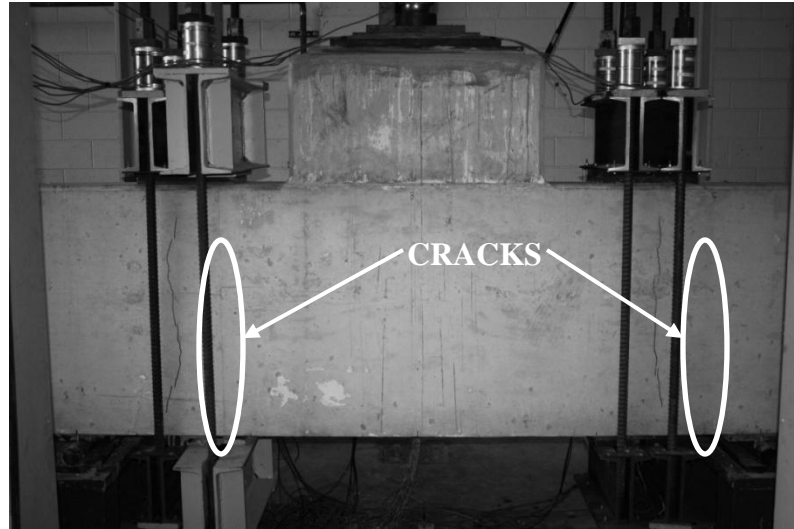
Test 3-S-PT post-tensioning cracks
